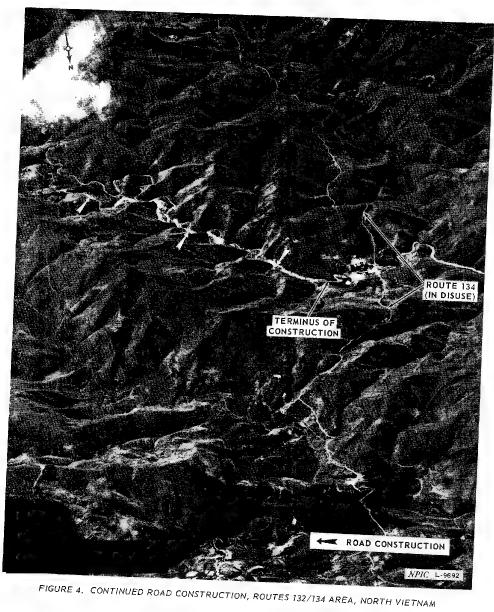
CONTINUED ROAD CONSTRUCTION, ROUTES 132/134 AREA, NORTH VIETNAM
